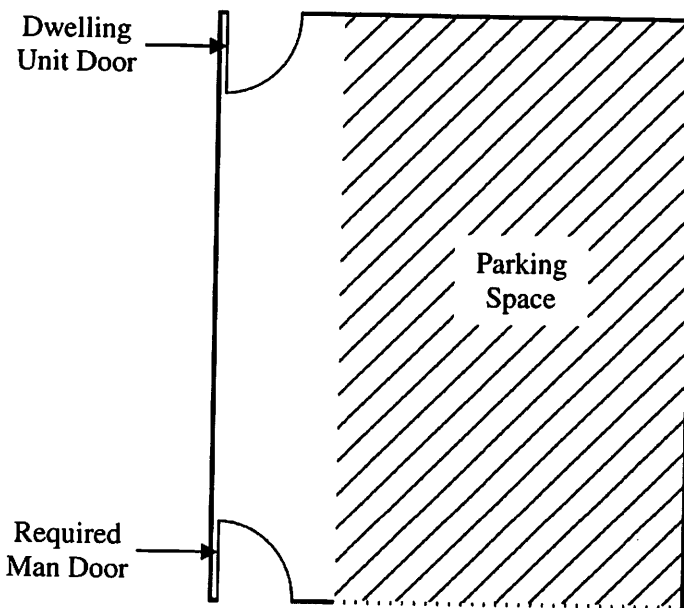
Example of private garage configuration where direct access is provided to a dwelling unit.
